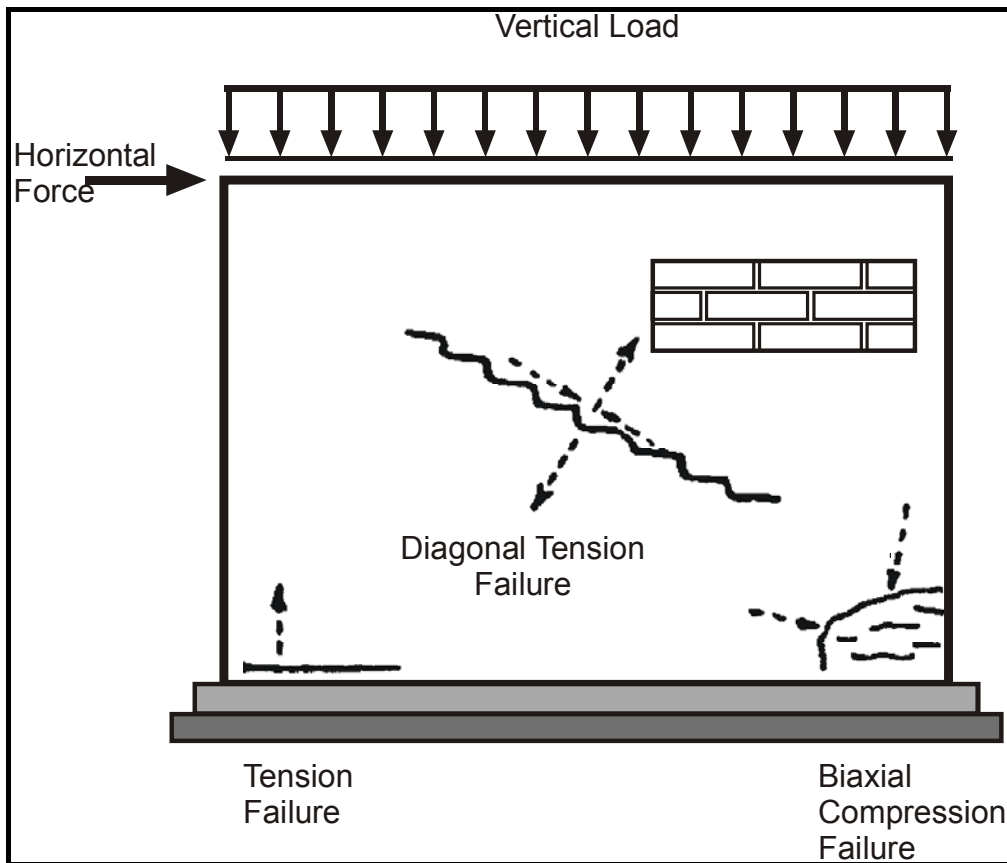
Modes of failure of shear wall, according to [168]
